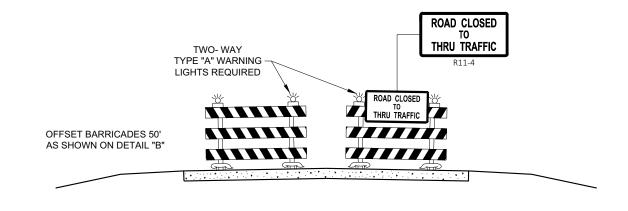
DETAIL D ROAD CLOSURE BARRICADE DETAIL APPROACH VIEW
